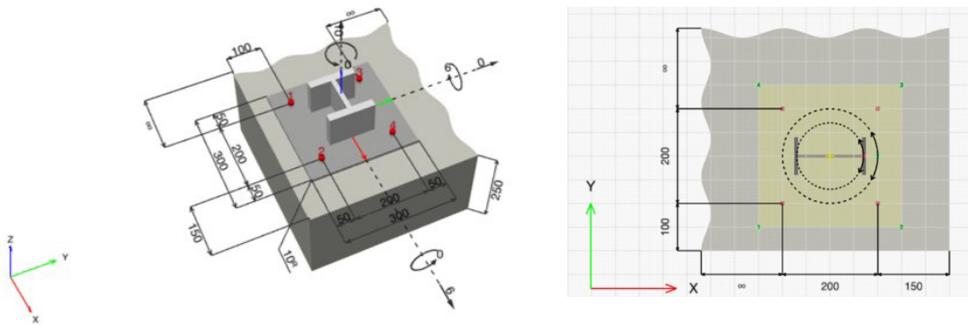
Baseplate connection using post-installed mechanical anchors
